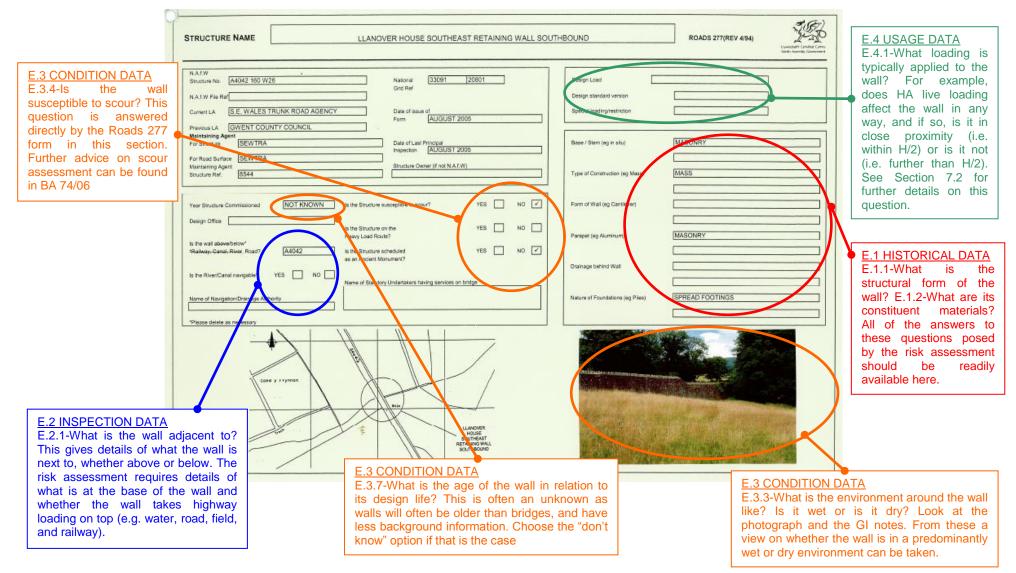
Using the Roads 277 to risk assess retaining walls (Page 1 of 2)
